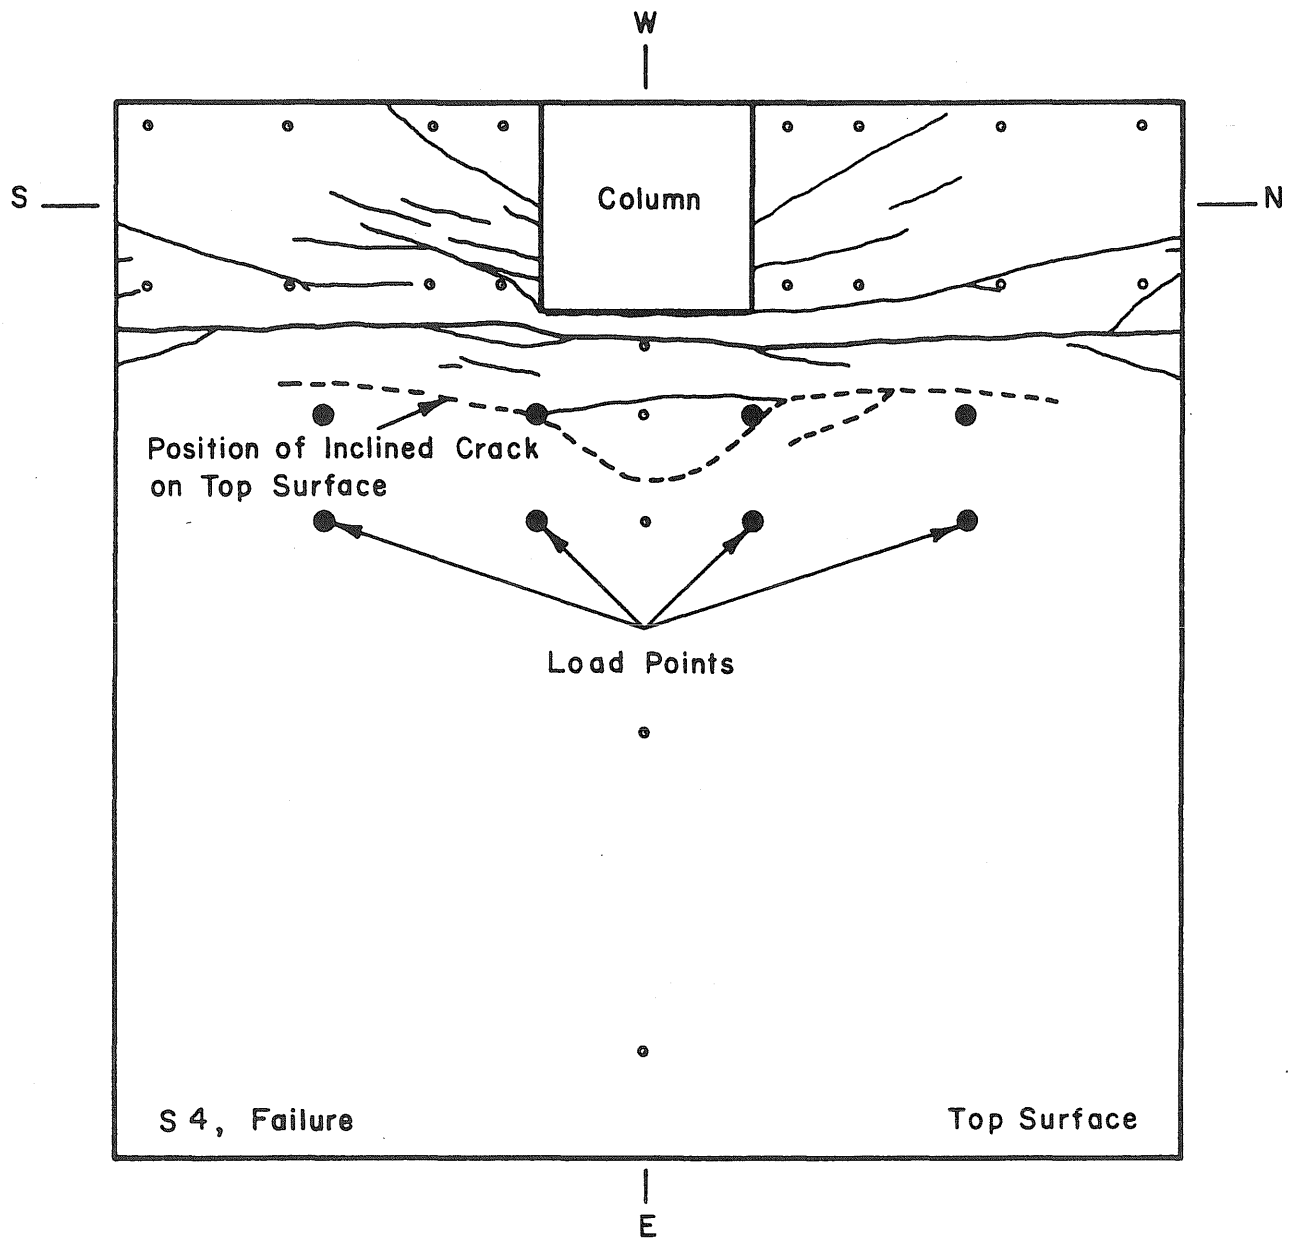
Crack Pattern at Failure on the Top Surface of Specimen S4
